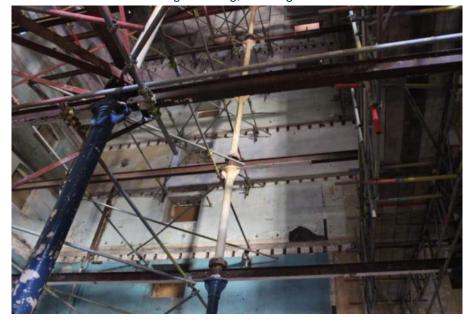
Interior of Maltings building, showing cast iron columns and iron I-beams (2017)
